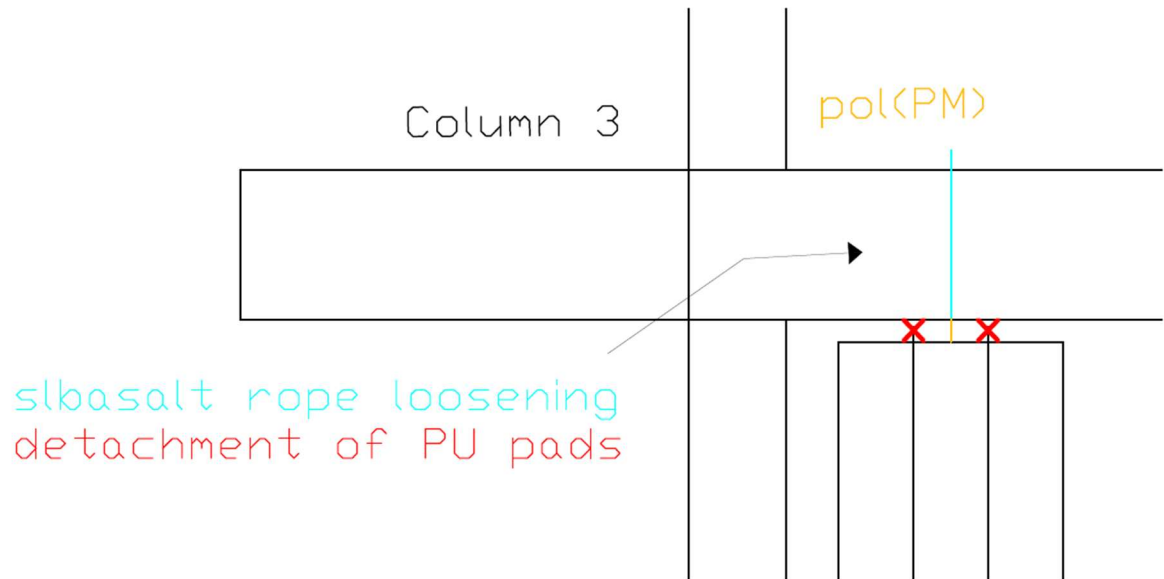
Anchoring details and PU pads dimensions (under the top slab), left living wall LW3-2L: detachment of PU pads after EQ1.3g (2)
